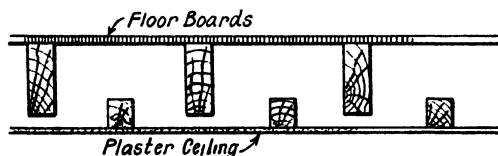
INDEPENDENT CEILING BELOW WOOD JOIST FLOOR
